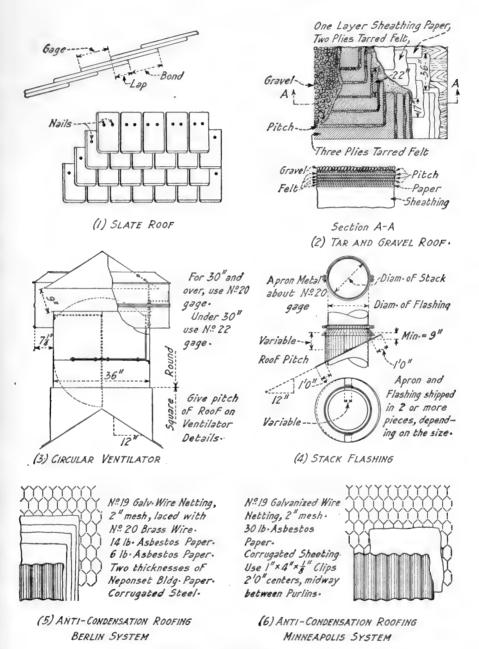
Details of Roofing, Ventilators and Anti-Condensation Lining.
